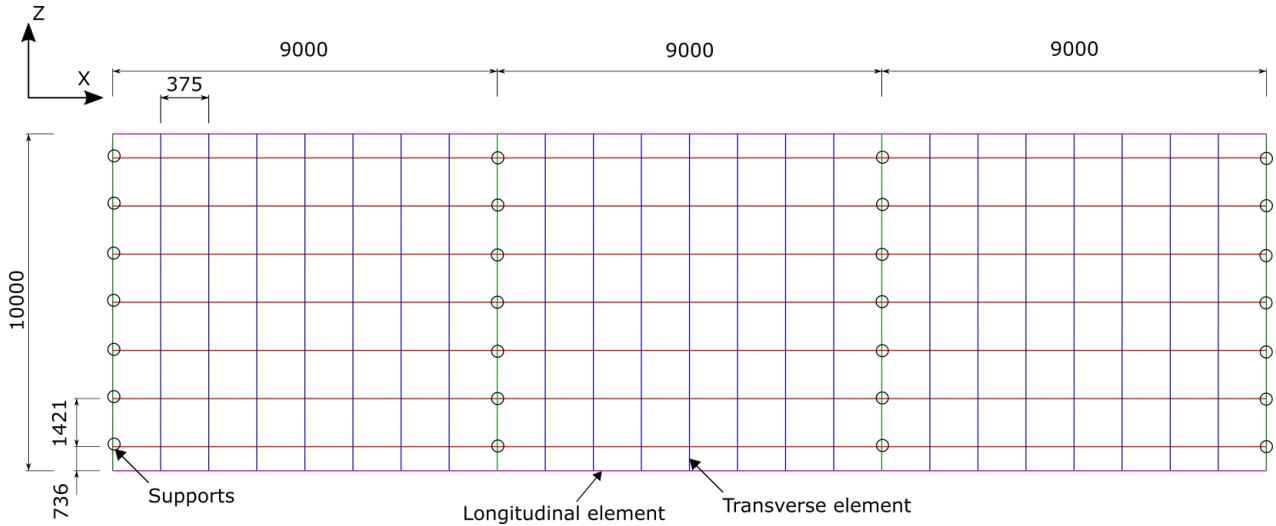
Plan view of grillage model, detailing dimensions (in mm)
